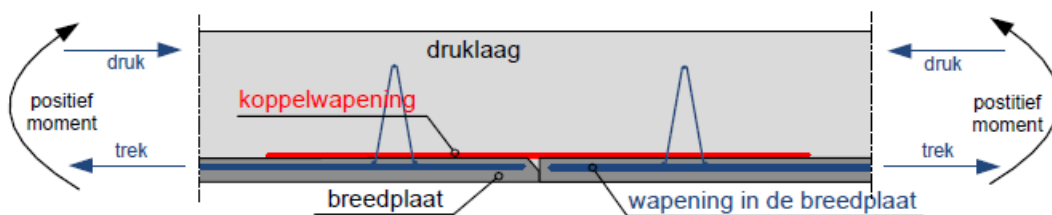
Examples of reinforcement detailing between adjacent floor plates (cross section to span direction)
